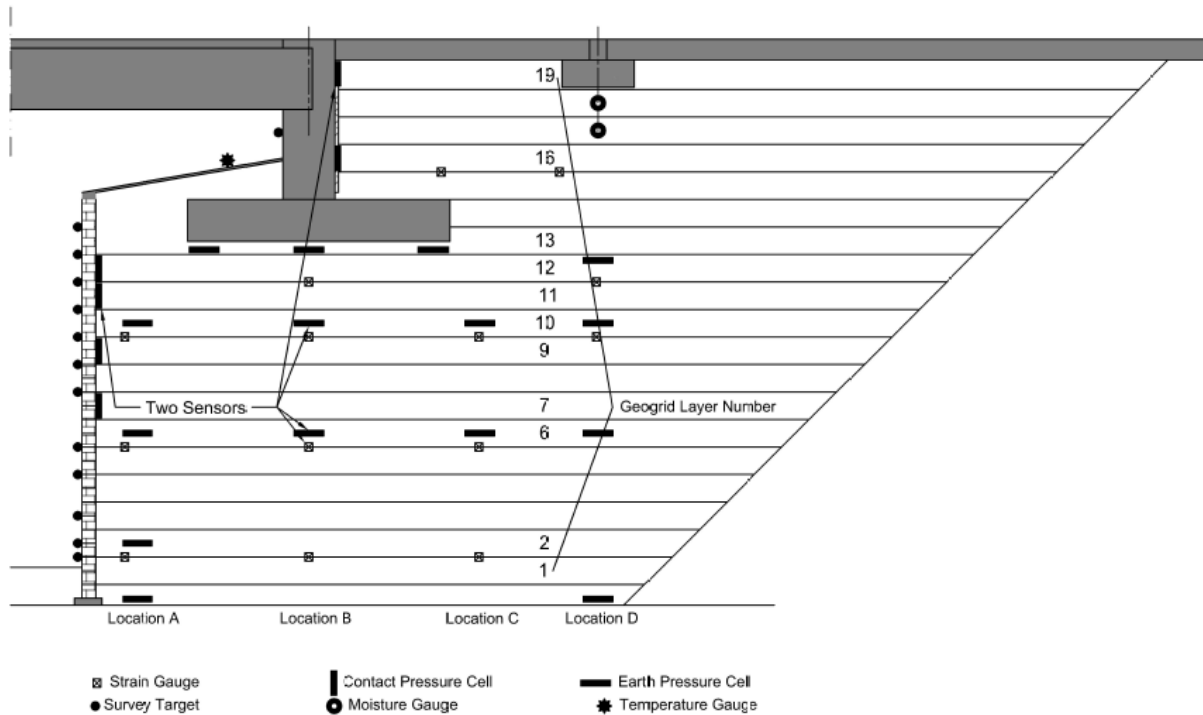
Layout of Instrumented Section 800 (redrawn after Abu-Hejleh et al. 2002).
